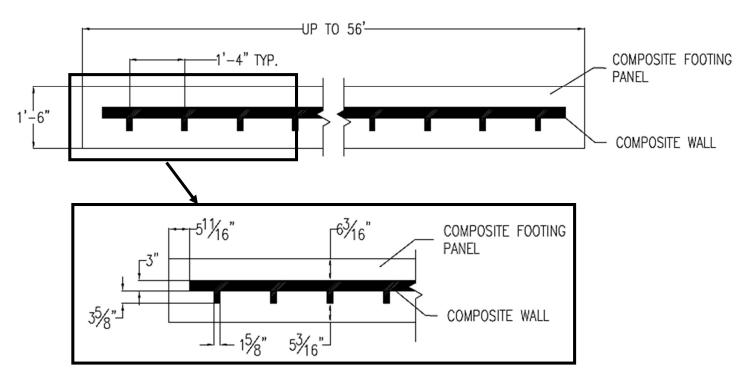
Composite Wall (ESR-4667) Load Area on Composite Footing Panel
